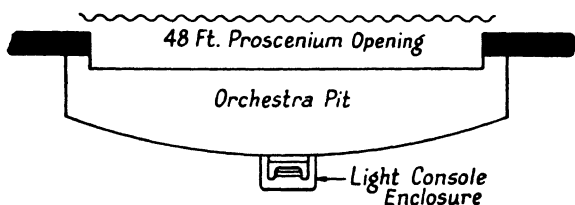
PLAN: POSITION OF LIGHT CONSOLE IF FIXED
